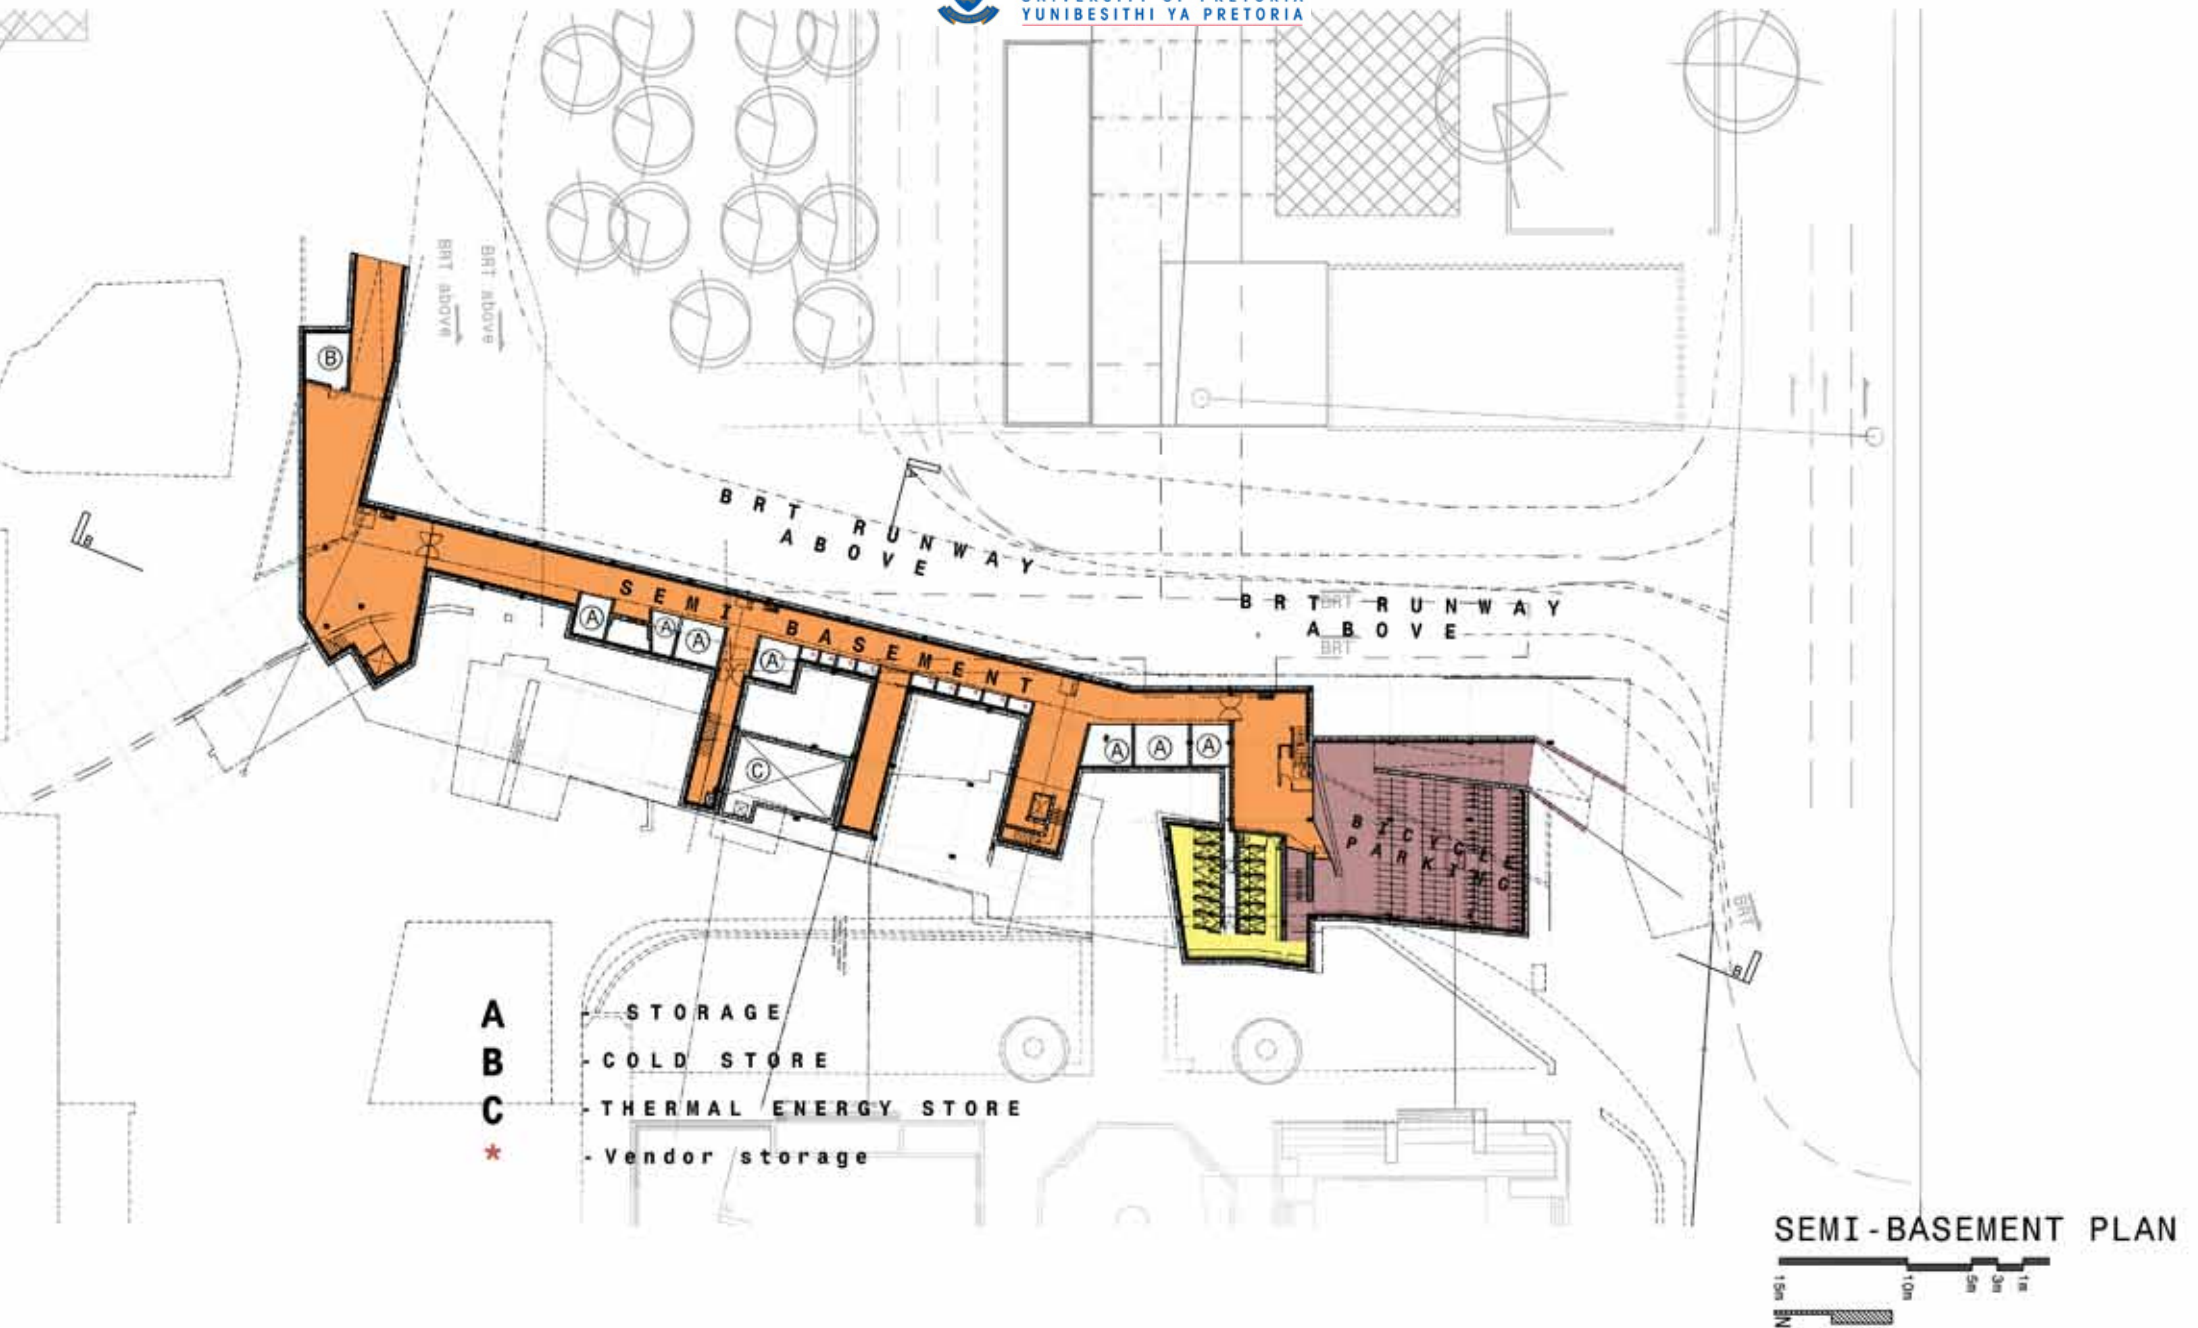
Semi basement plan, not to scale [Source: Author]
